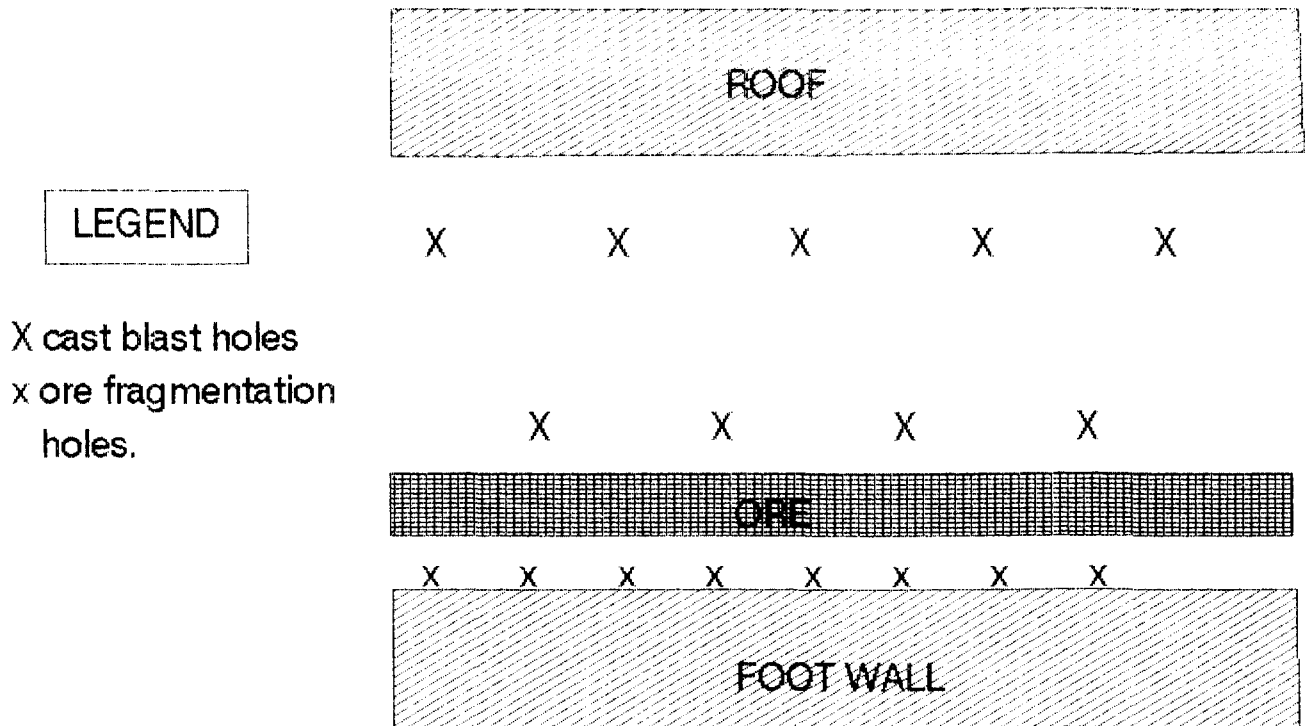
Front elevation of a selective blast mining stope indicating blast drill holes
